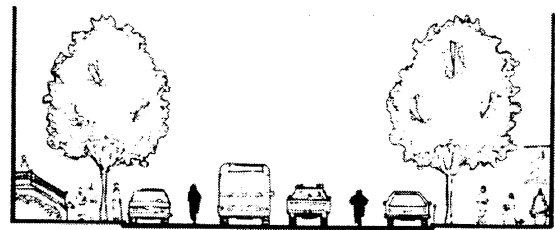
Cross-section of a bike lane between travel lanes and on-street parallel parking
